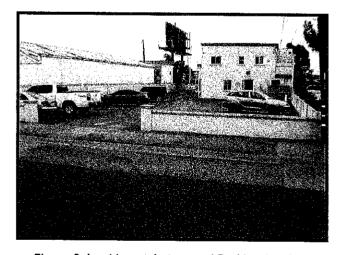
Looking at Autosound Parking Lot from Alley 010. Note block wall at parking lot egress.
